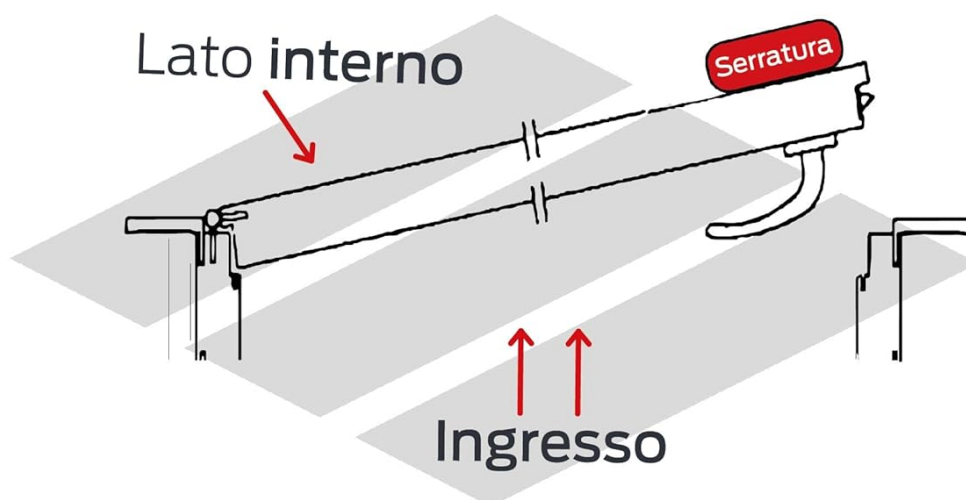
Cisa Elettrika 1A731 Handedness Adjustment. This illustration demonstrates how the lock can be configured for both right-hand and left-hand opening doors by adjusting the internal components.
